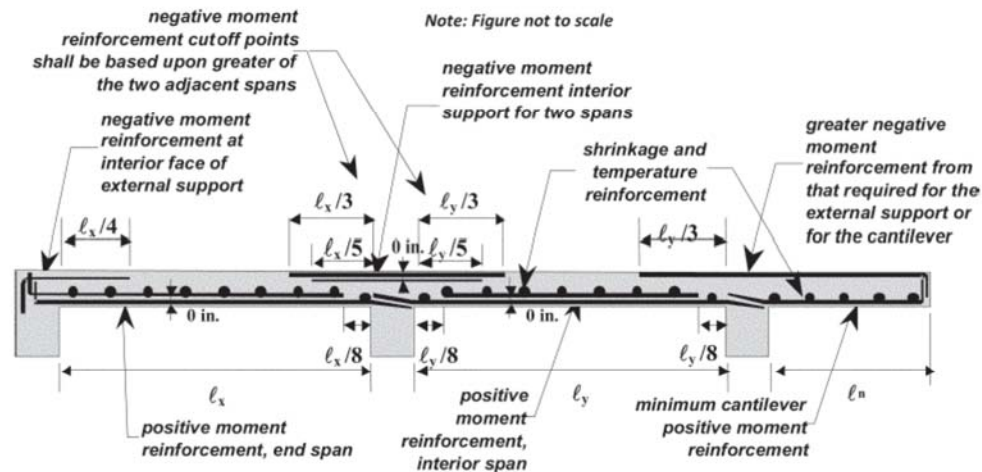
Reinforcement for two-span one-way slabs supported by girders, beams, or reinforced concrete walls.
